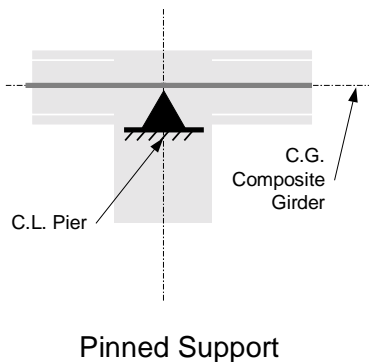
Integral Pier Connection on a Zero Height Idealized Pier
